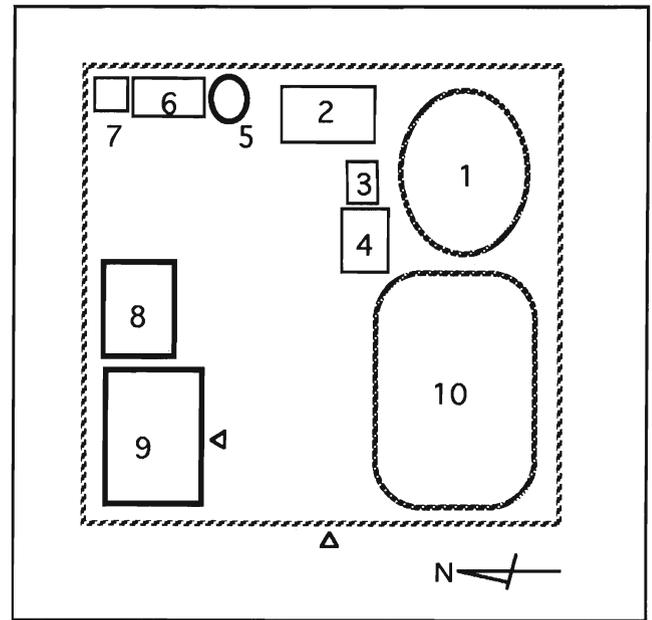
Arrangement of a site (Dong Xuan Thanh family)
